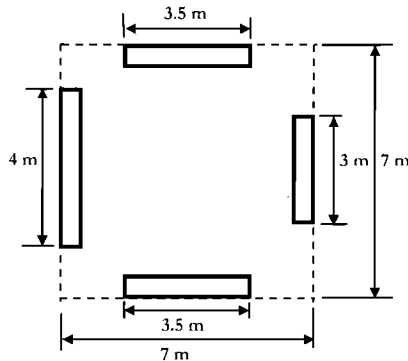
A Conceptual Unreinforced Masonry Building with Strength Eccentricity (Plan View)
